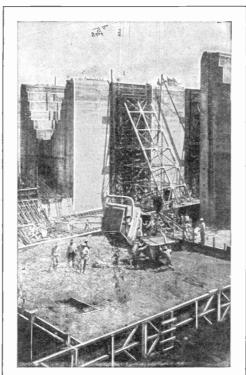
DROPPING THE CONCRETE INTO PLACE
